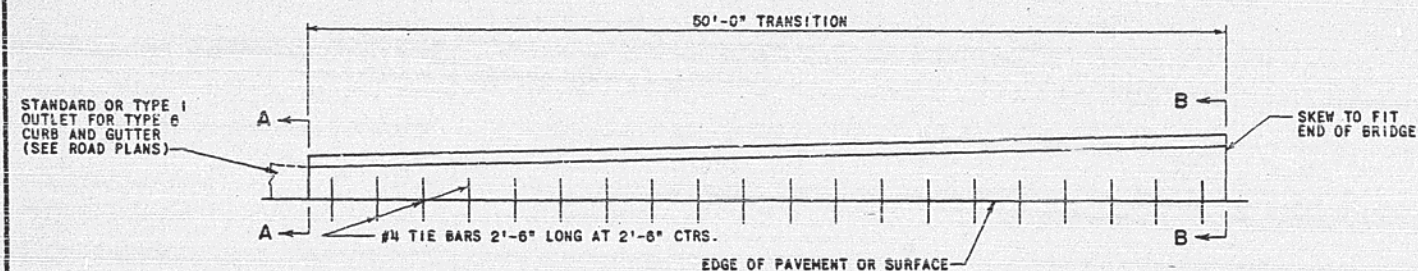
DETAIL OF SPECIAL INLET FOR COMBINATION CONCRETE CURB & GUTTER TYPE 3 & TYPE 6
